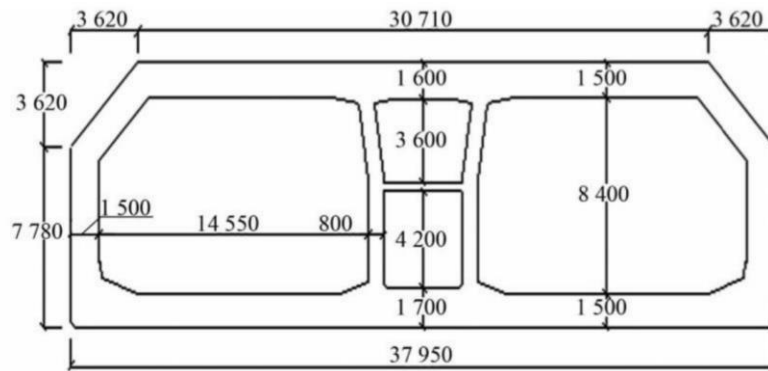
Cross-sectional dimensions of immersed tunnel (unit: mm) [1]
